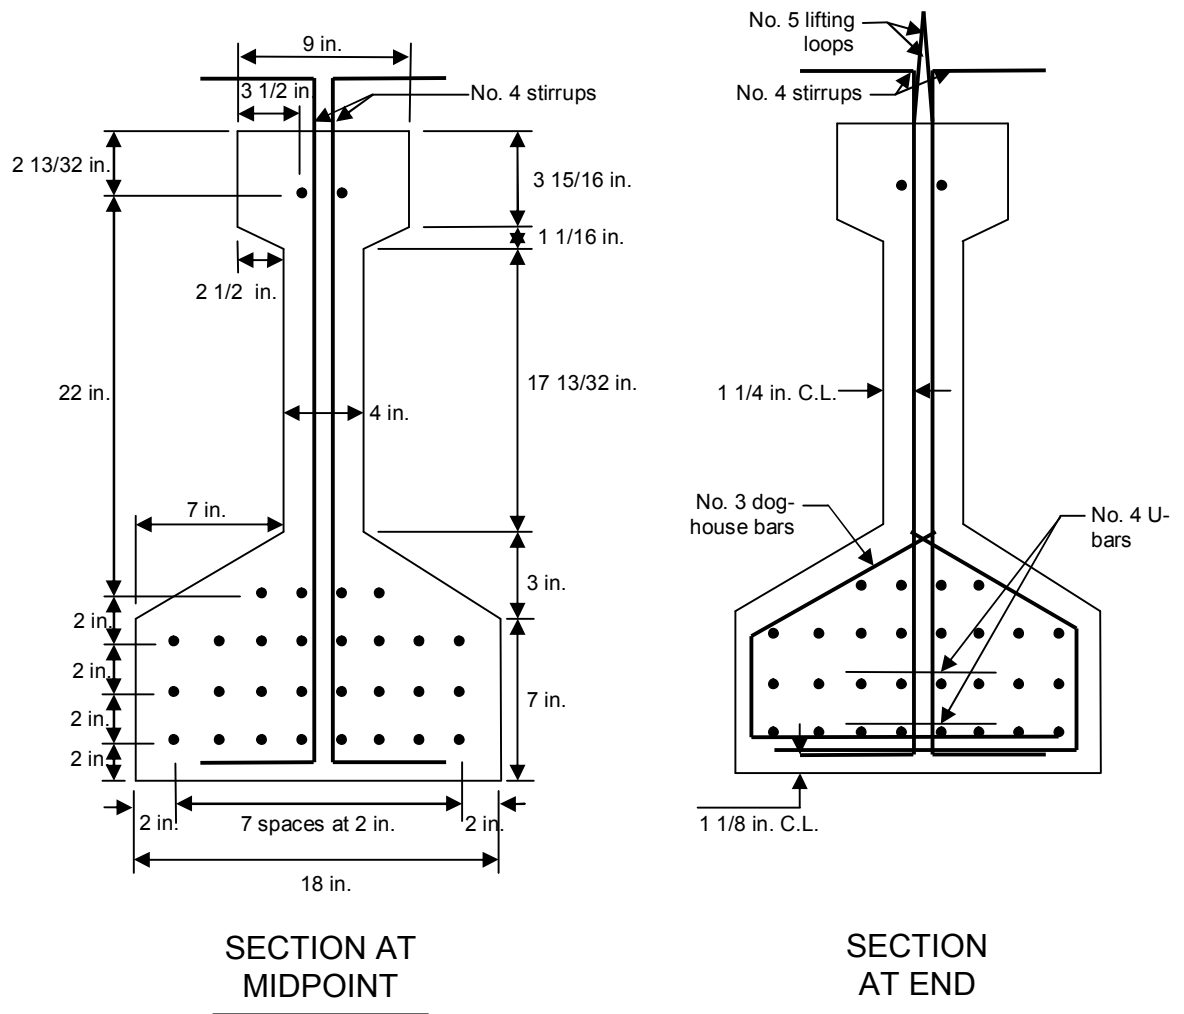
Design cross section for Girder 3 (reduced top flange). As-built sections shown in Chapter 6.
